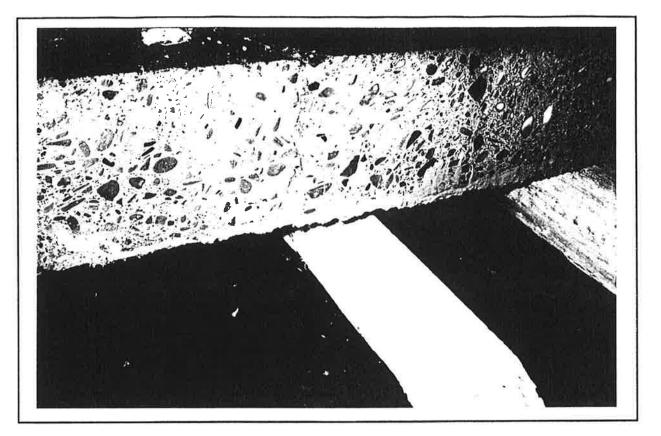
END VIEW OF REMOVED SECTION FROM DRIP PAD SHOWING CRACK
